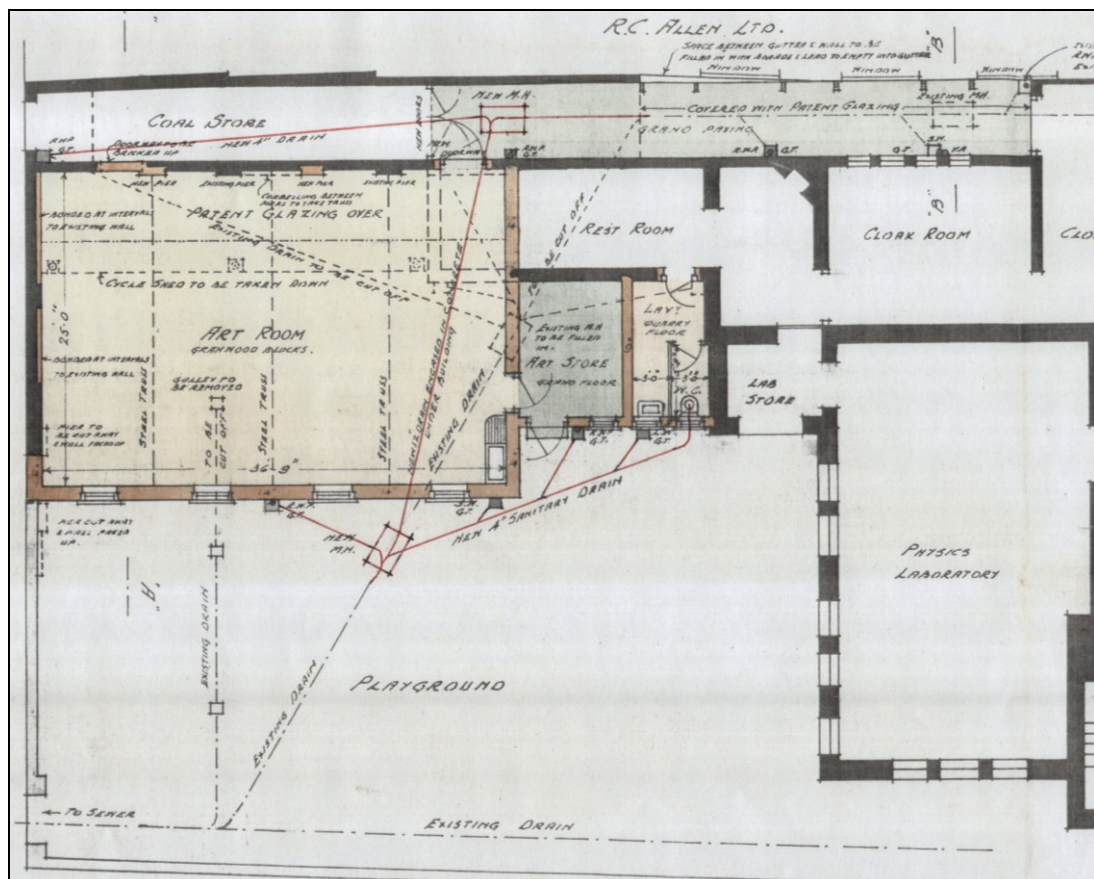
Original architects drawings showing floor plan for art room of 1927. (LBR Plan 1927/34028. Not to scale).
